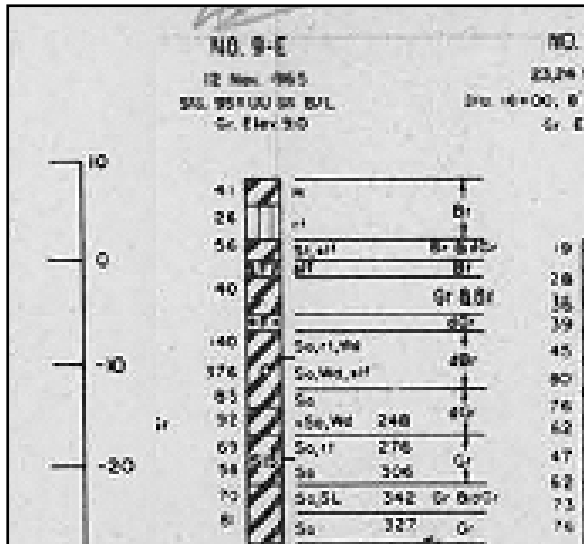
Boring 9E (Sta 95+00 B/L) Shows Approximate Depth of Fat Clay (CH) is 3 feet at Crown Elevation 9 ft
